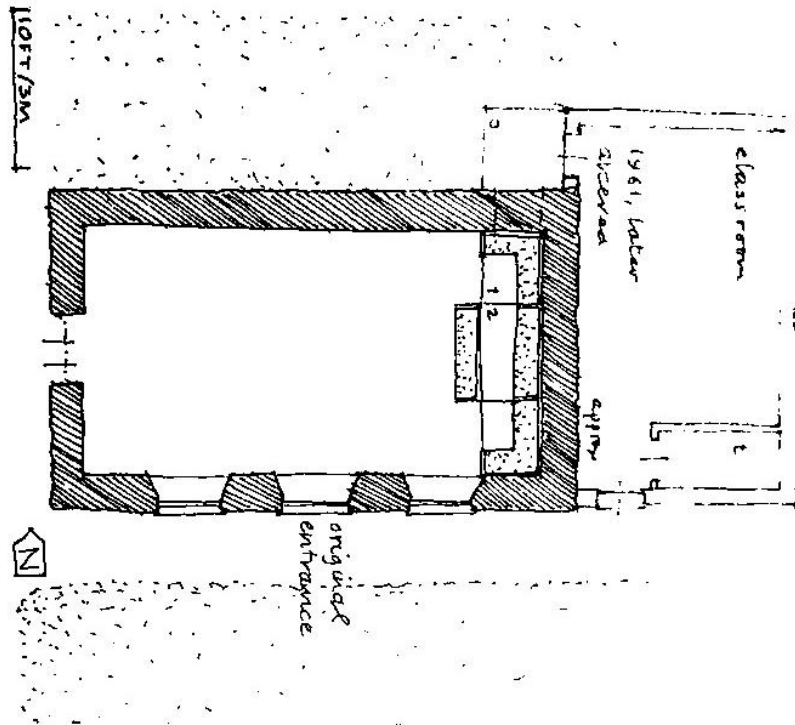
Plan of the meeting house before the 2007 alterations (north is at the top; not to scale) (Butler, vol. 1, p. 67)
